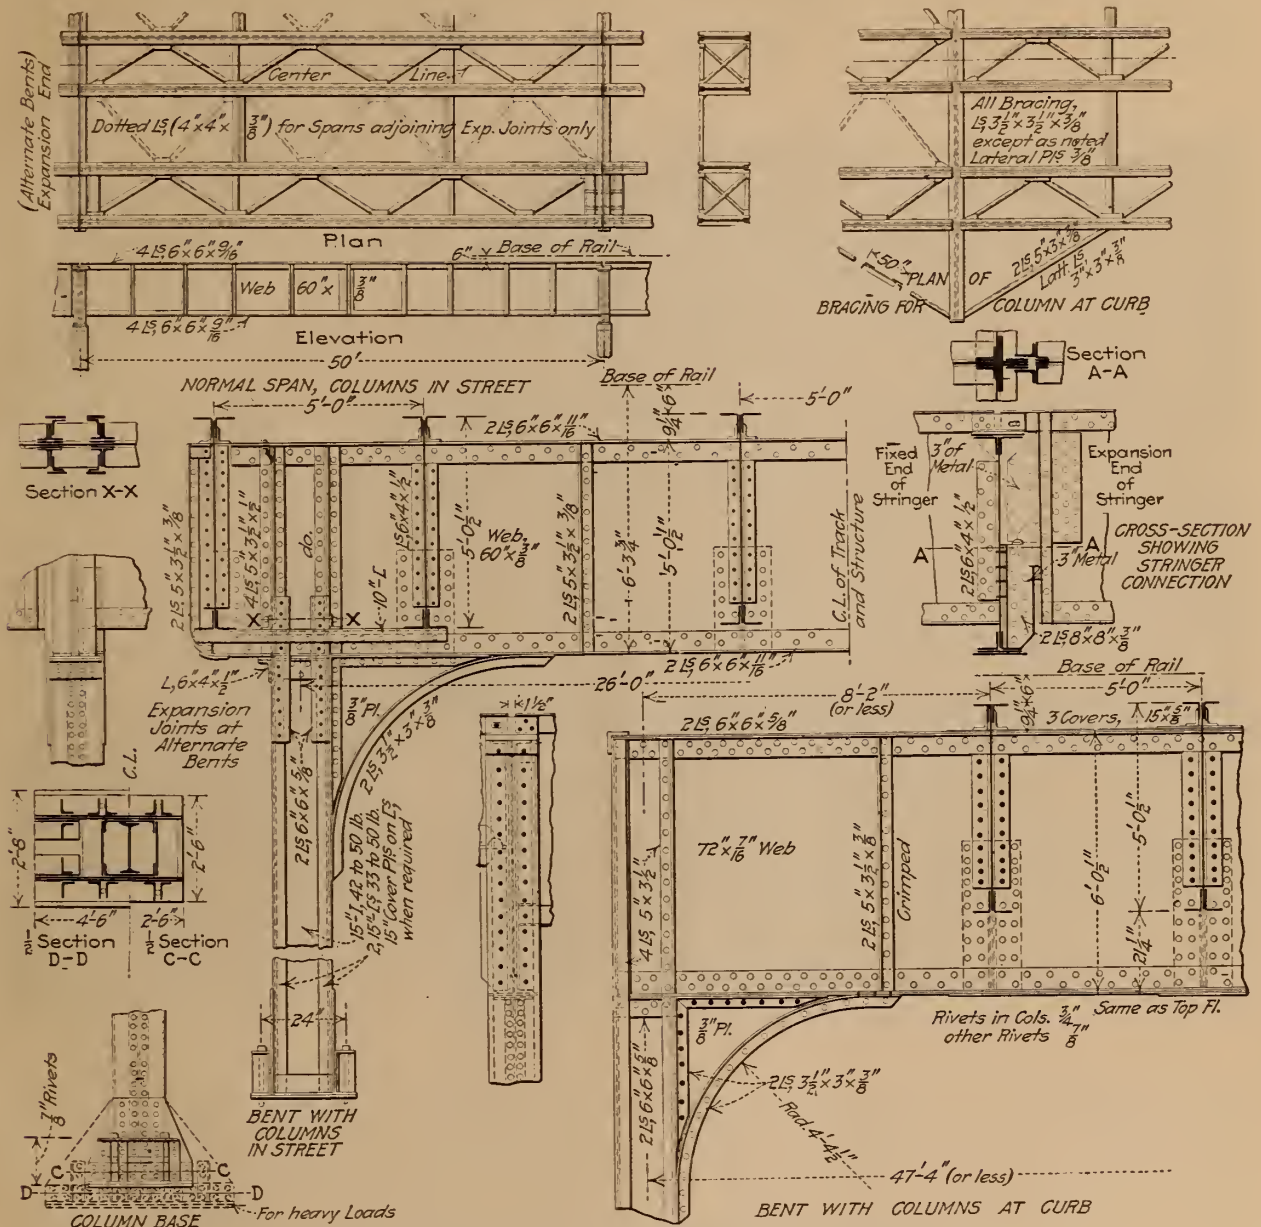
DETAILS OF ELEVATED-RAILWAY CONSTRUCTION
